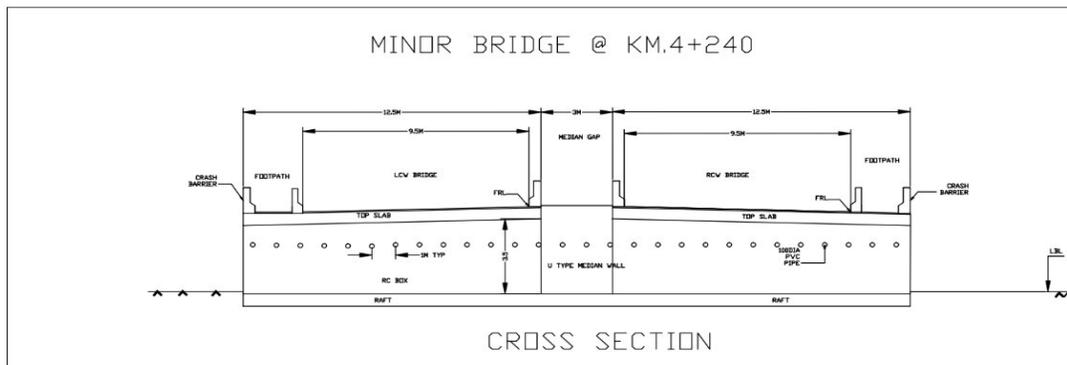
Cross Section of MINOR BRIDGE @ Km.4+240
